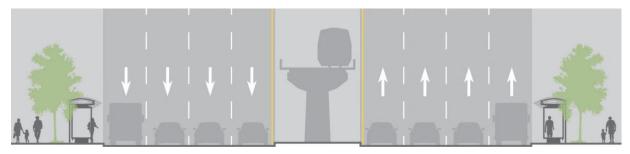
| Alternative 2 cross-section of Tyco Road from Route 7 to Spring Hill Road
